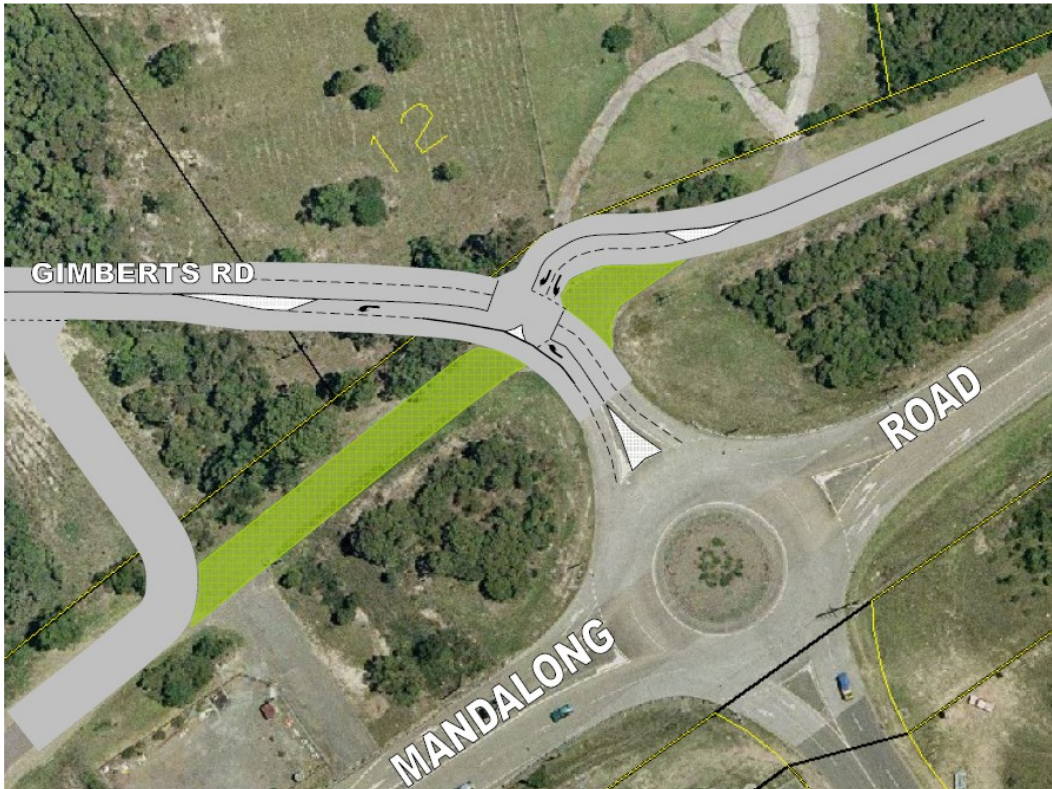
Access Arrangements from Mandalong Road (Option 1)
